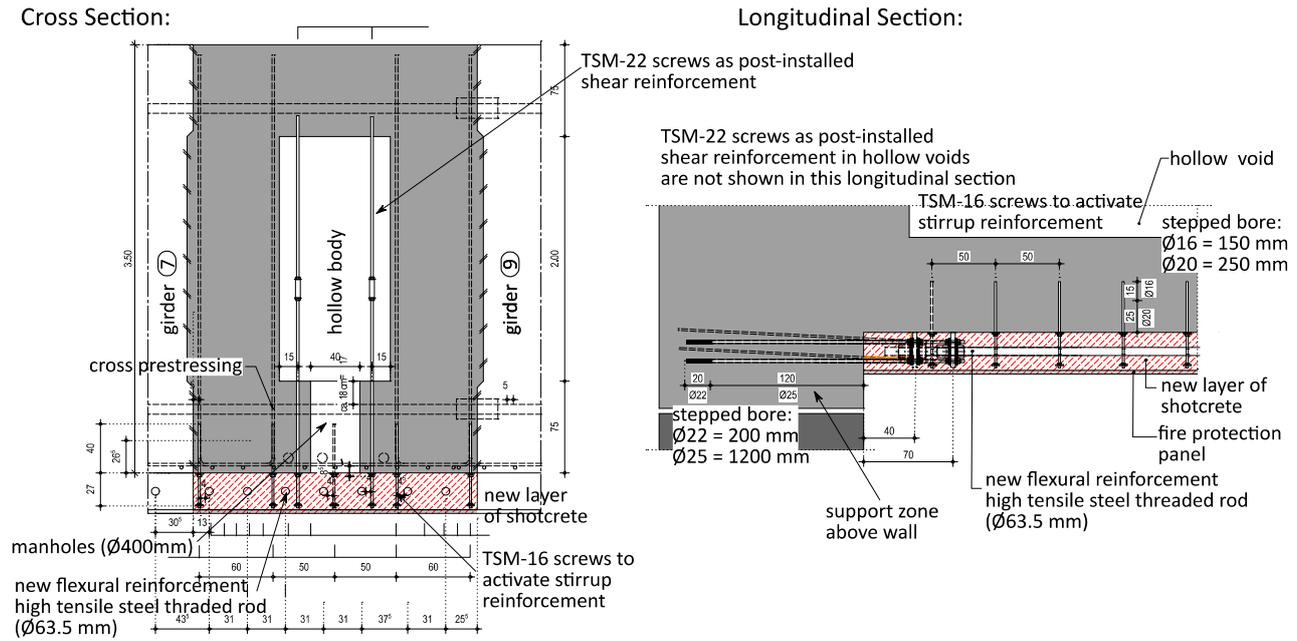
Planned shear and flexural reinforcement by the use of concrete screw anchors as shear reinforcement and threaded rods of high tensile steel as new flexural reinforcement.
